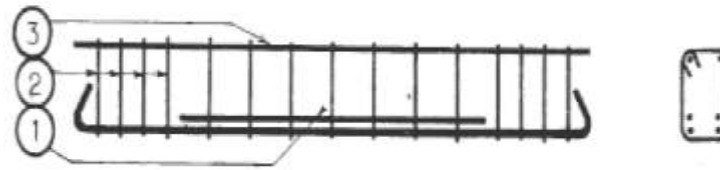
Main steel bars (Source: v. Davidovici, 1974)
